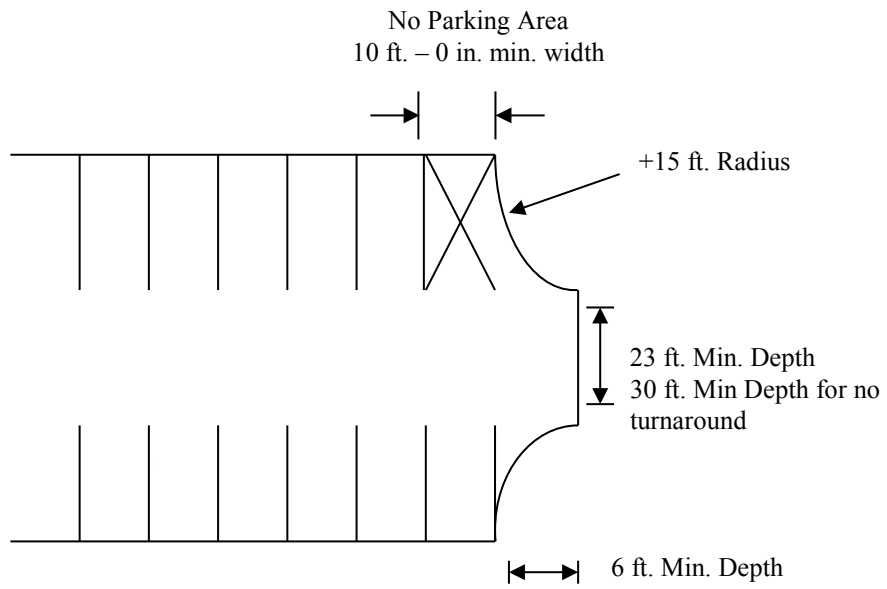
Typical Turnaround Design for 90° Parking Access Drive
